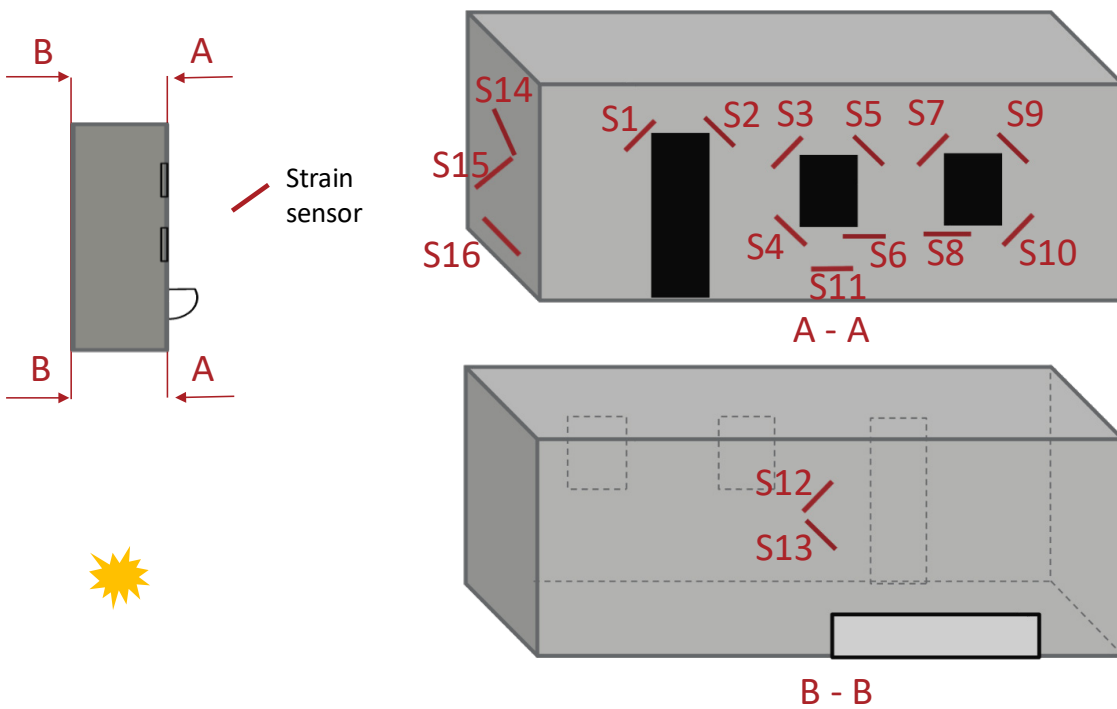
Second blast test, instrumentation of test building. Position of strain sensors on test building. The instrumented short side of the building faces the blasting area.
